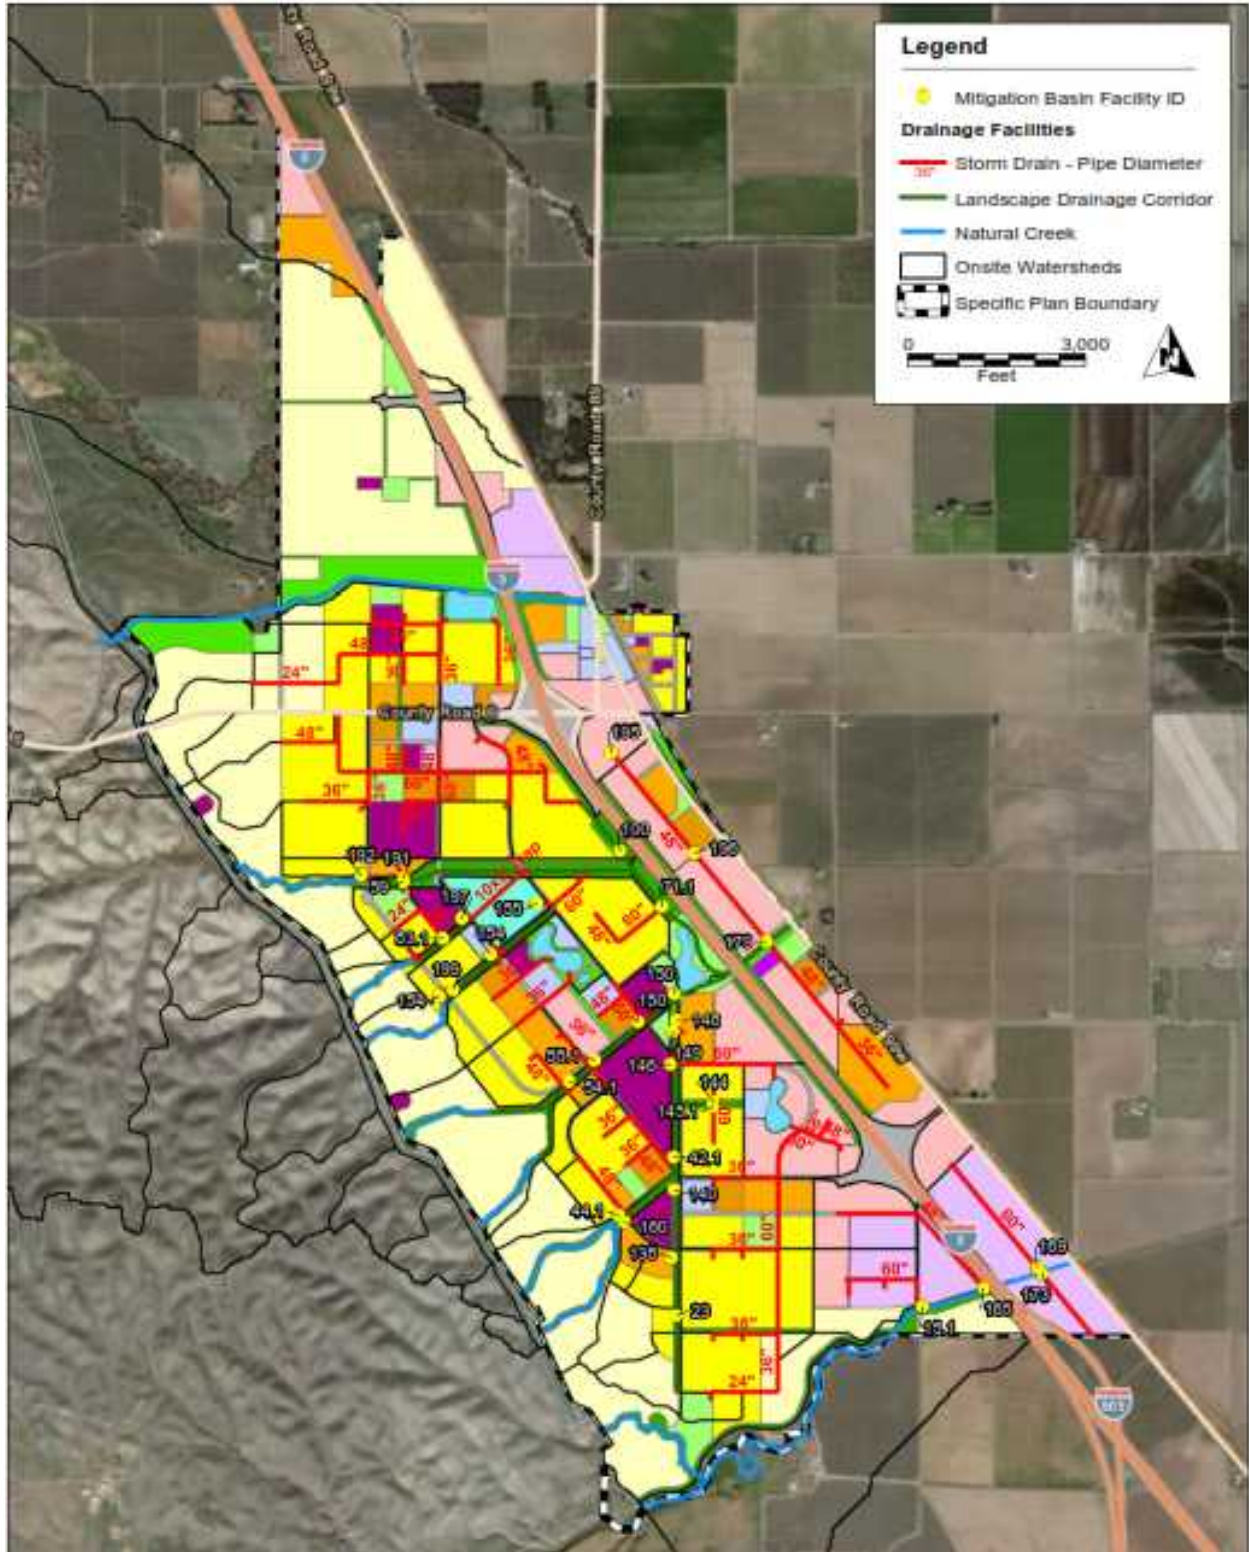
Proposed On-Site Drainage and Stormwater Mitigation Facilities
